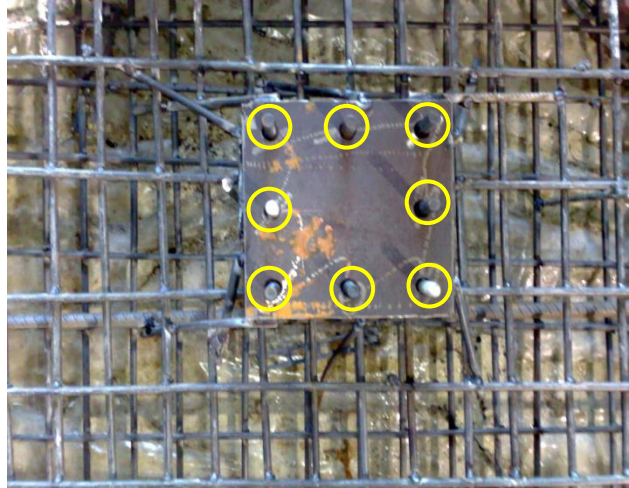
A general view of the bolts welded to the foundation for the transducers
